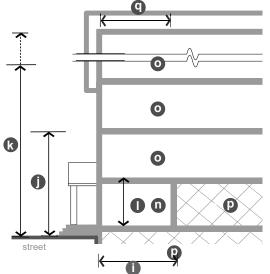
(3). Townhouse Building: Height and Use Requirements
